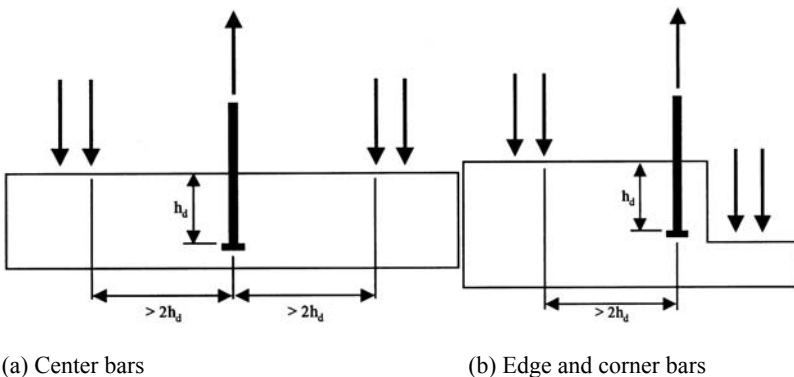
Shallow embedment pullout test setup (Adapted from DeVries et al., 1999)
